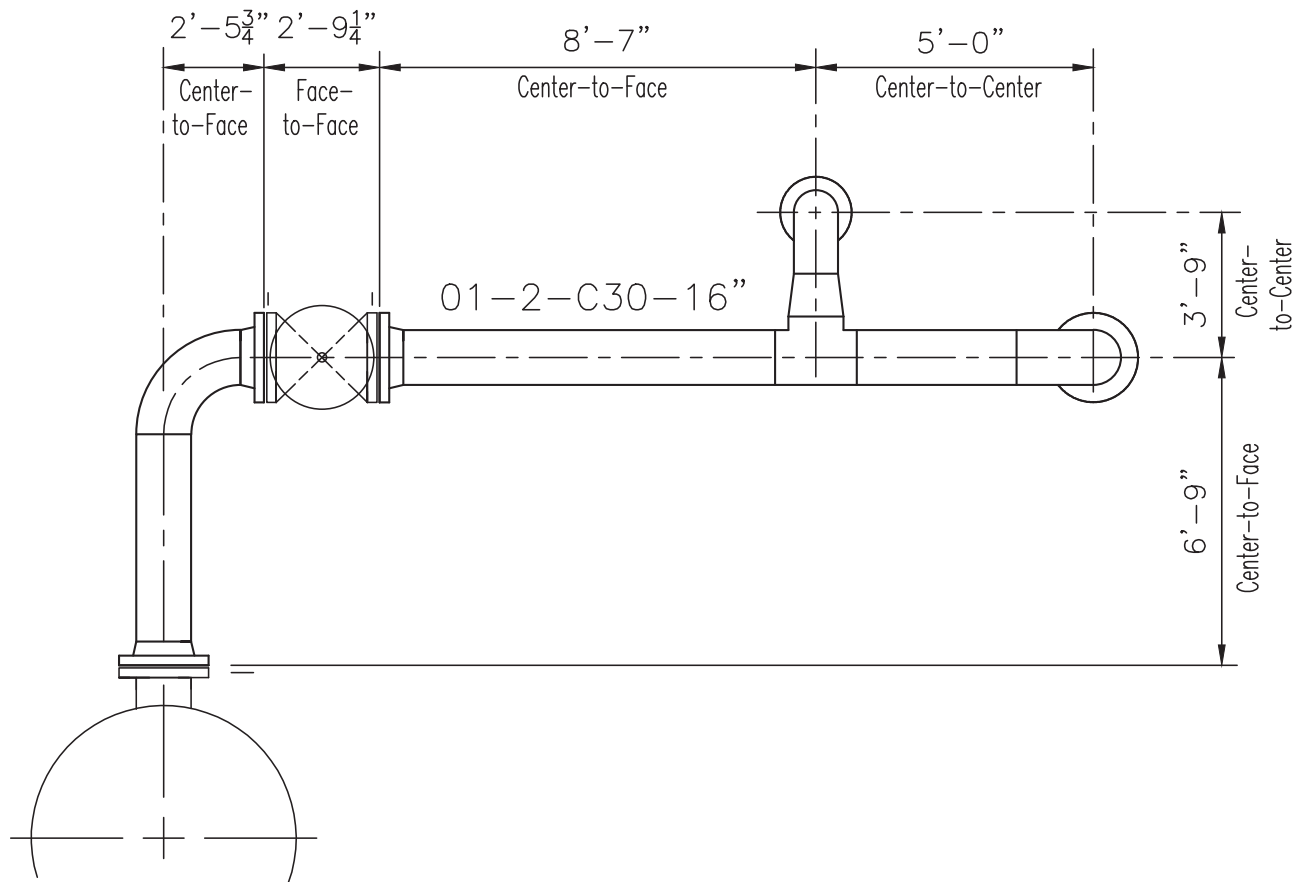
Placement of dimensions on butt-weld configurations.
